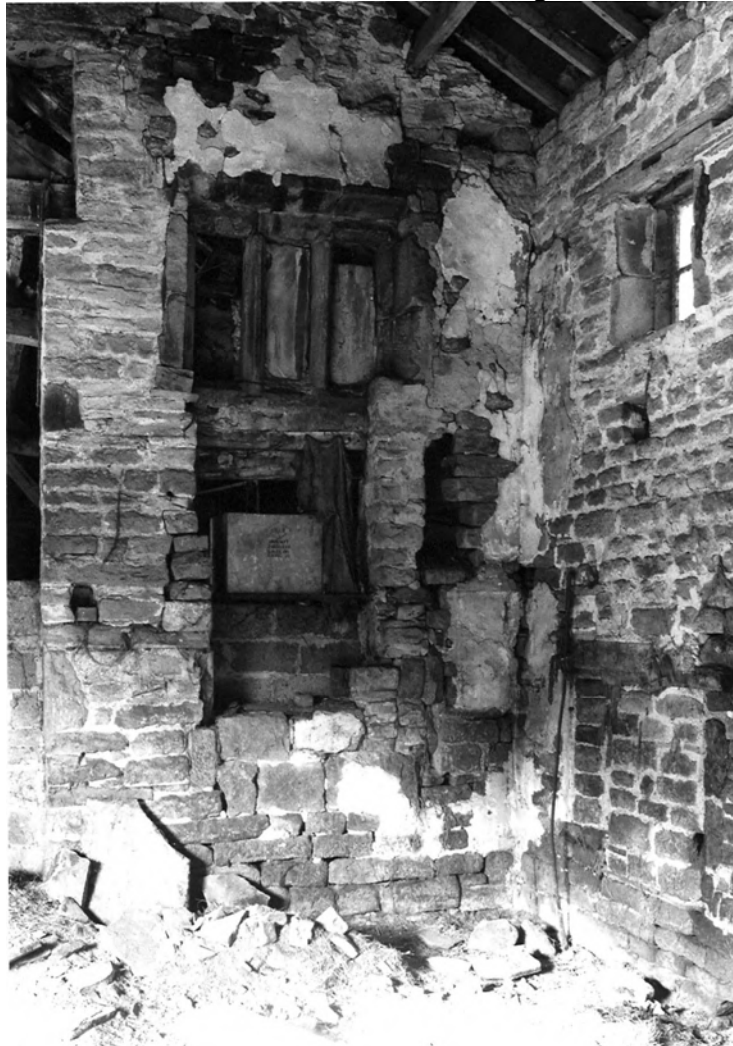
Shaw House Farm: Aisled Barn Interior. Facing West.
